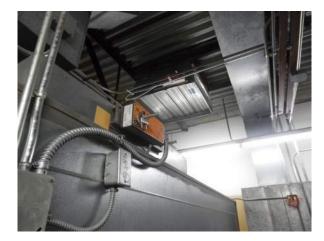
Relief air damper and actuator for AHU ventilation requirements.
